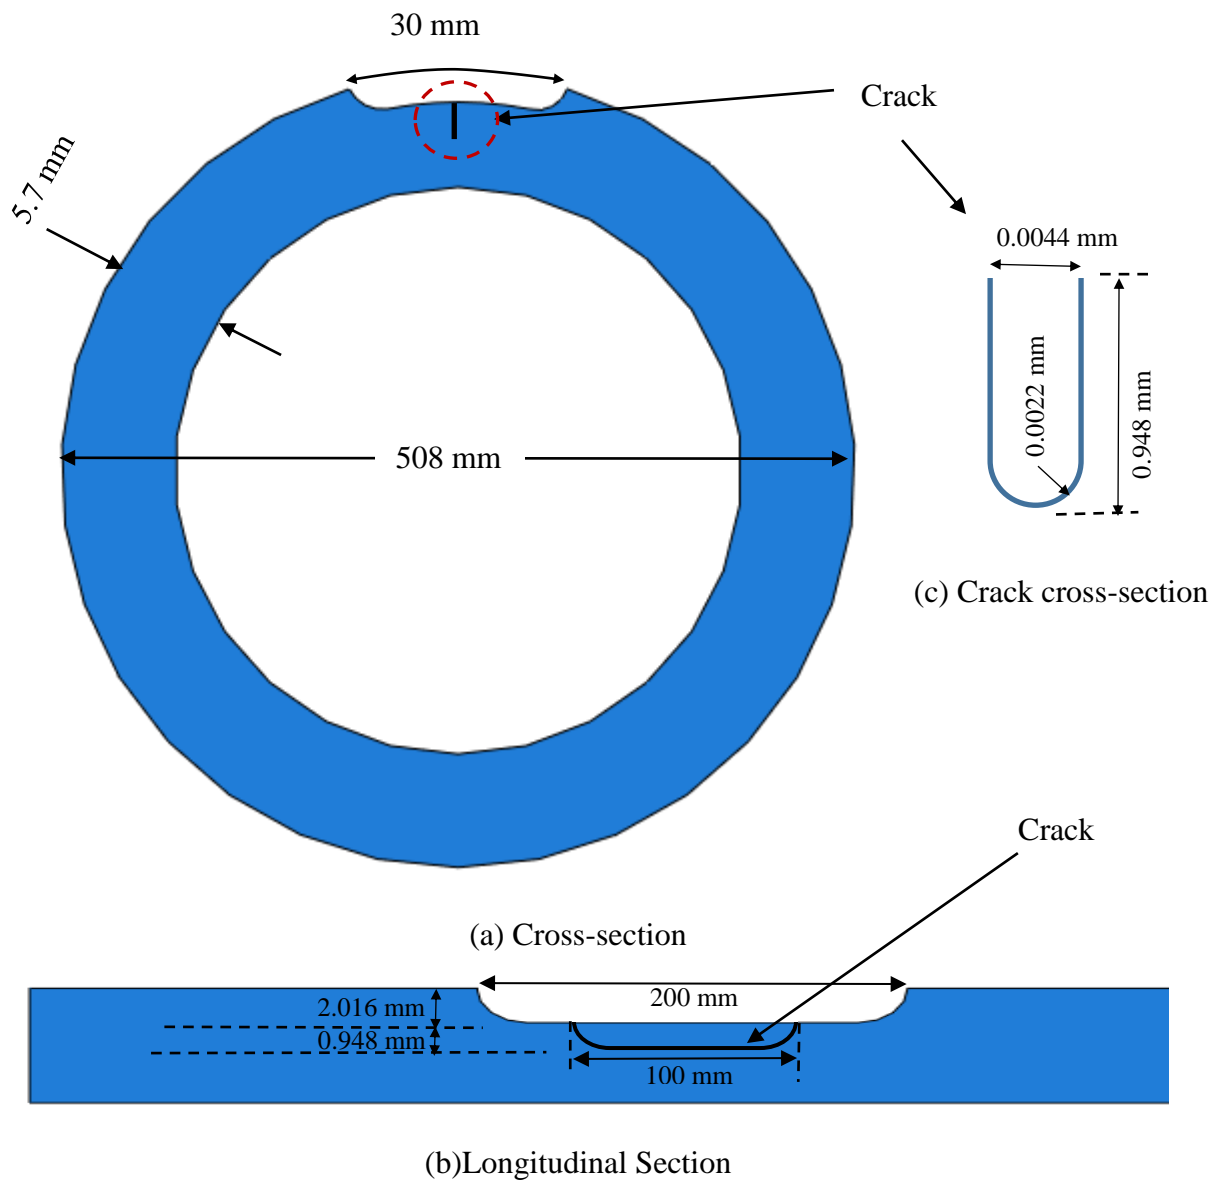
Sectional view of pipe with crack-in-corrosion (CIC) defect (Not to scale)
